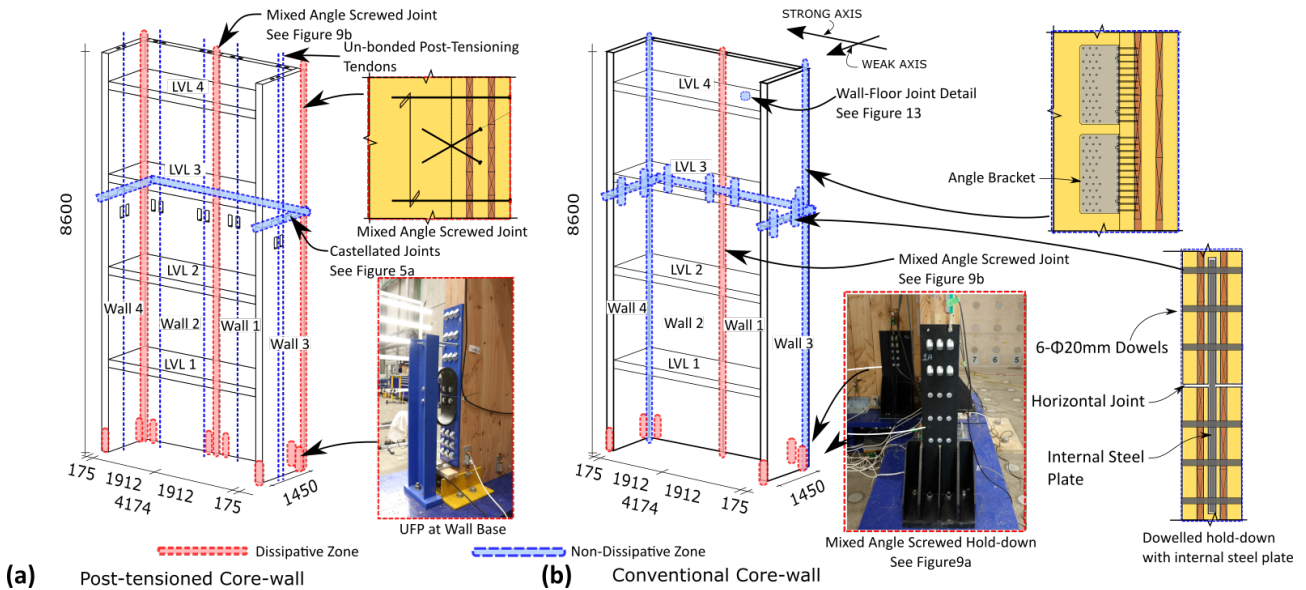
Hierarchy of strength highlighting dissipative (in red) and non-dissipative (in blue) zones for (a) post-tensioned core-wall system and (b) conventional core-wall system
